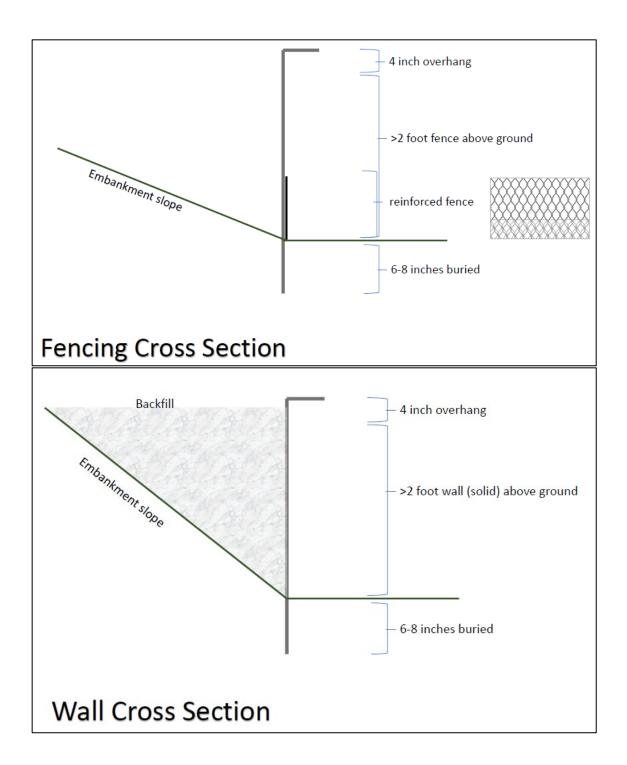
Turtle-proof fence and wall cross section views. Note: backfill on road side of wall (lower figure) enables turtles and wildlife that reached the road to get back to the riparian lands.
